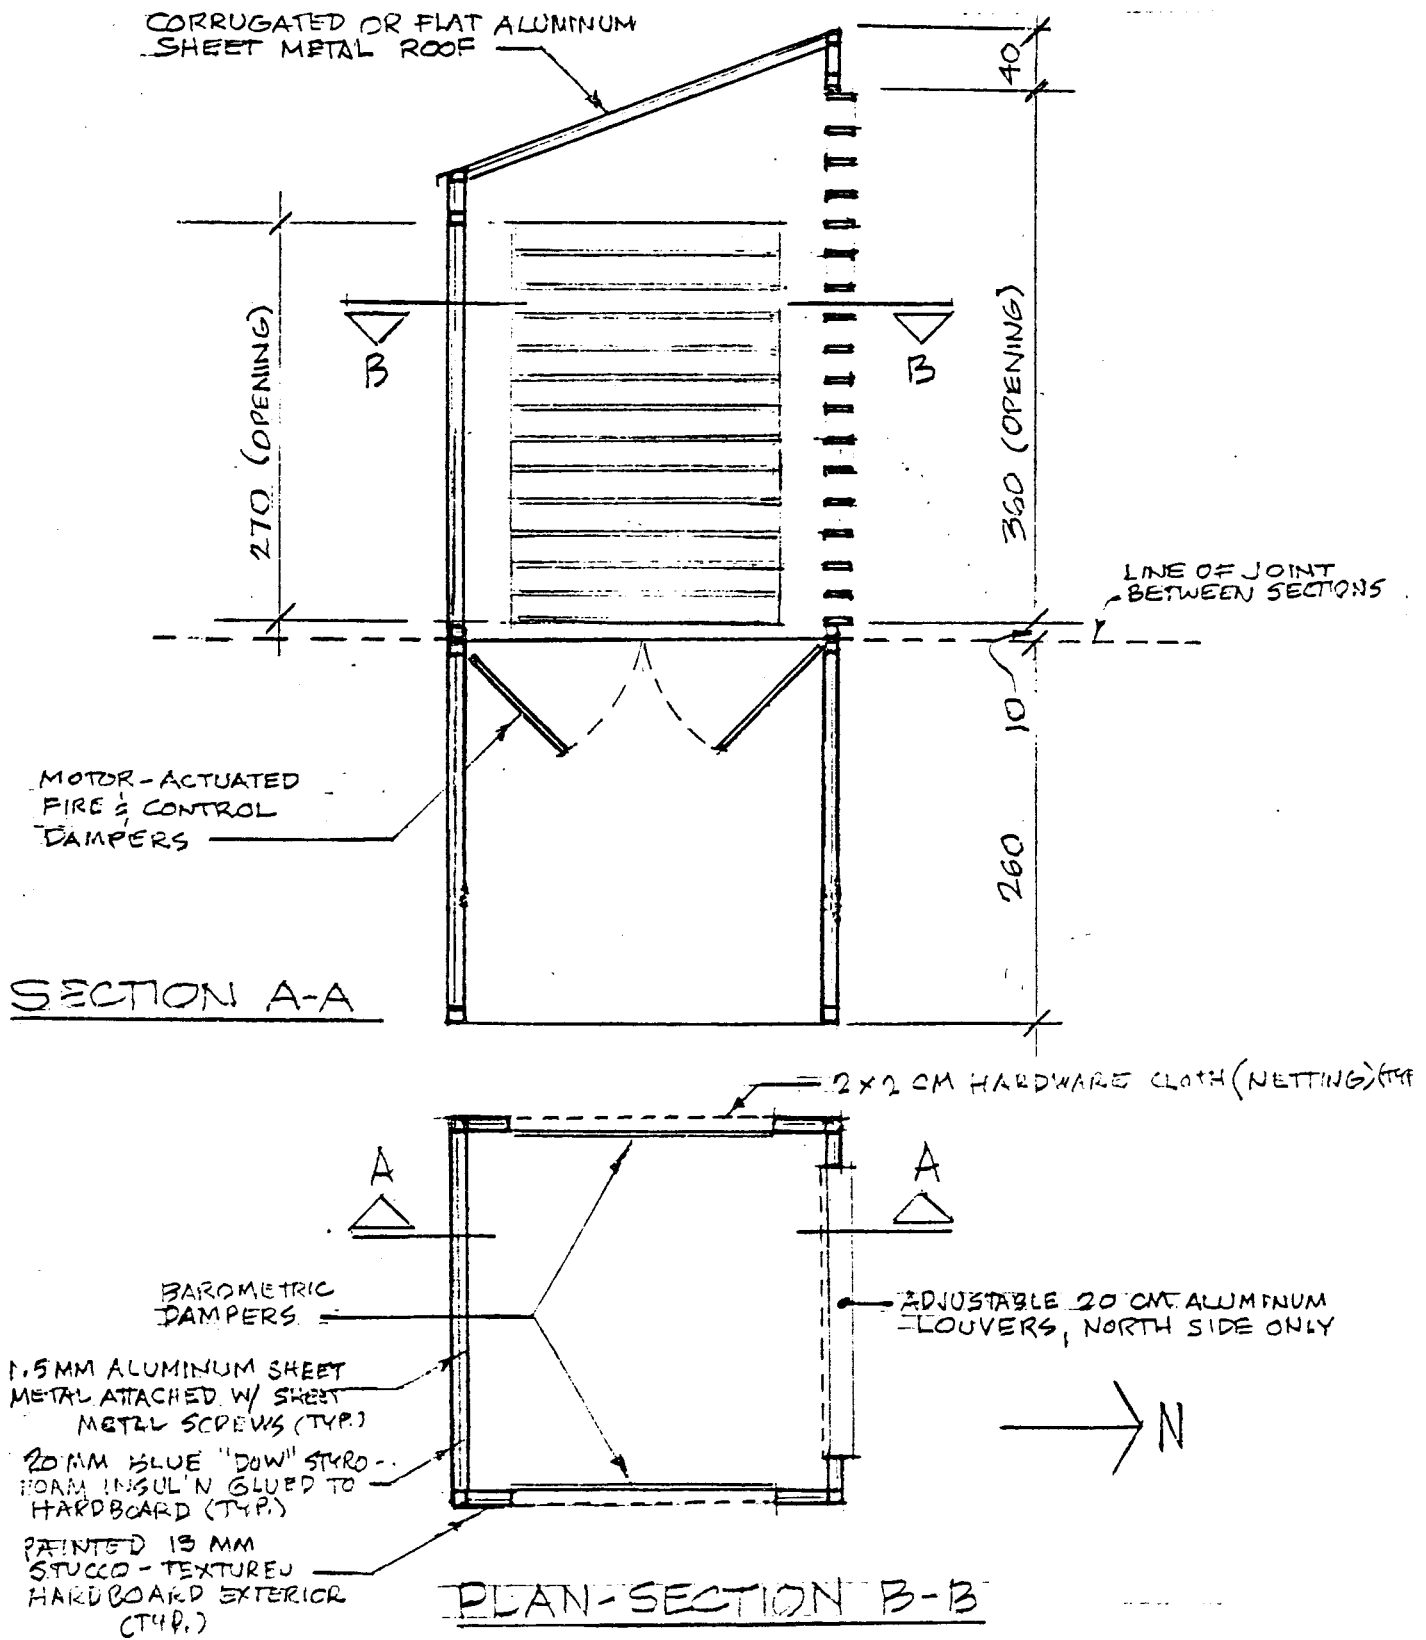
WIND TOWER (STEEL-FRAMED SECTION) ALT. #1.
